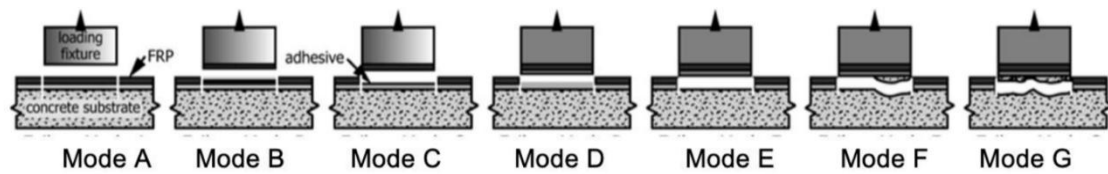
FRP-concrete bond failure modes under pull-off test (ASTM, 2021b)
